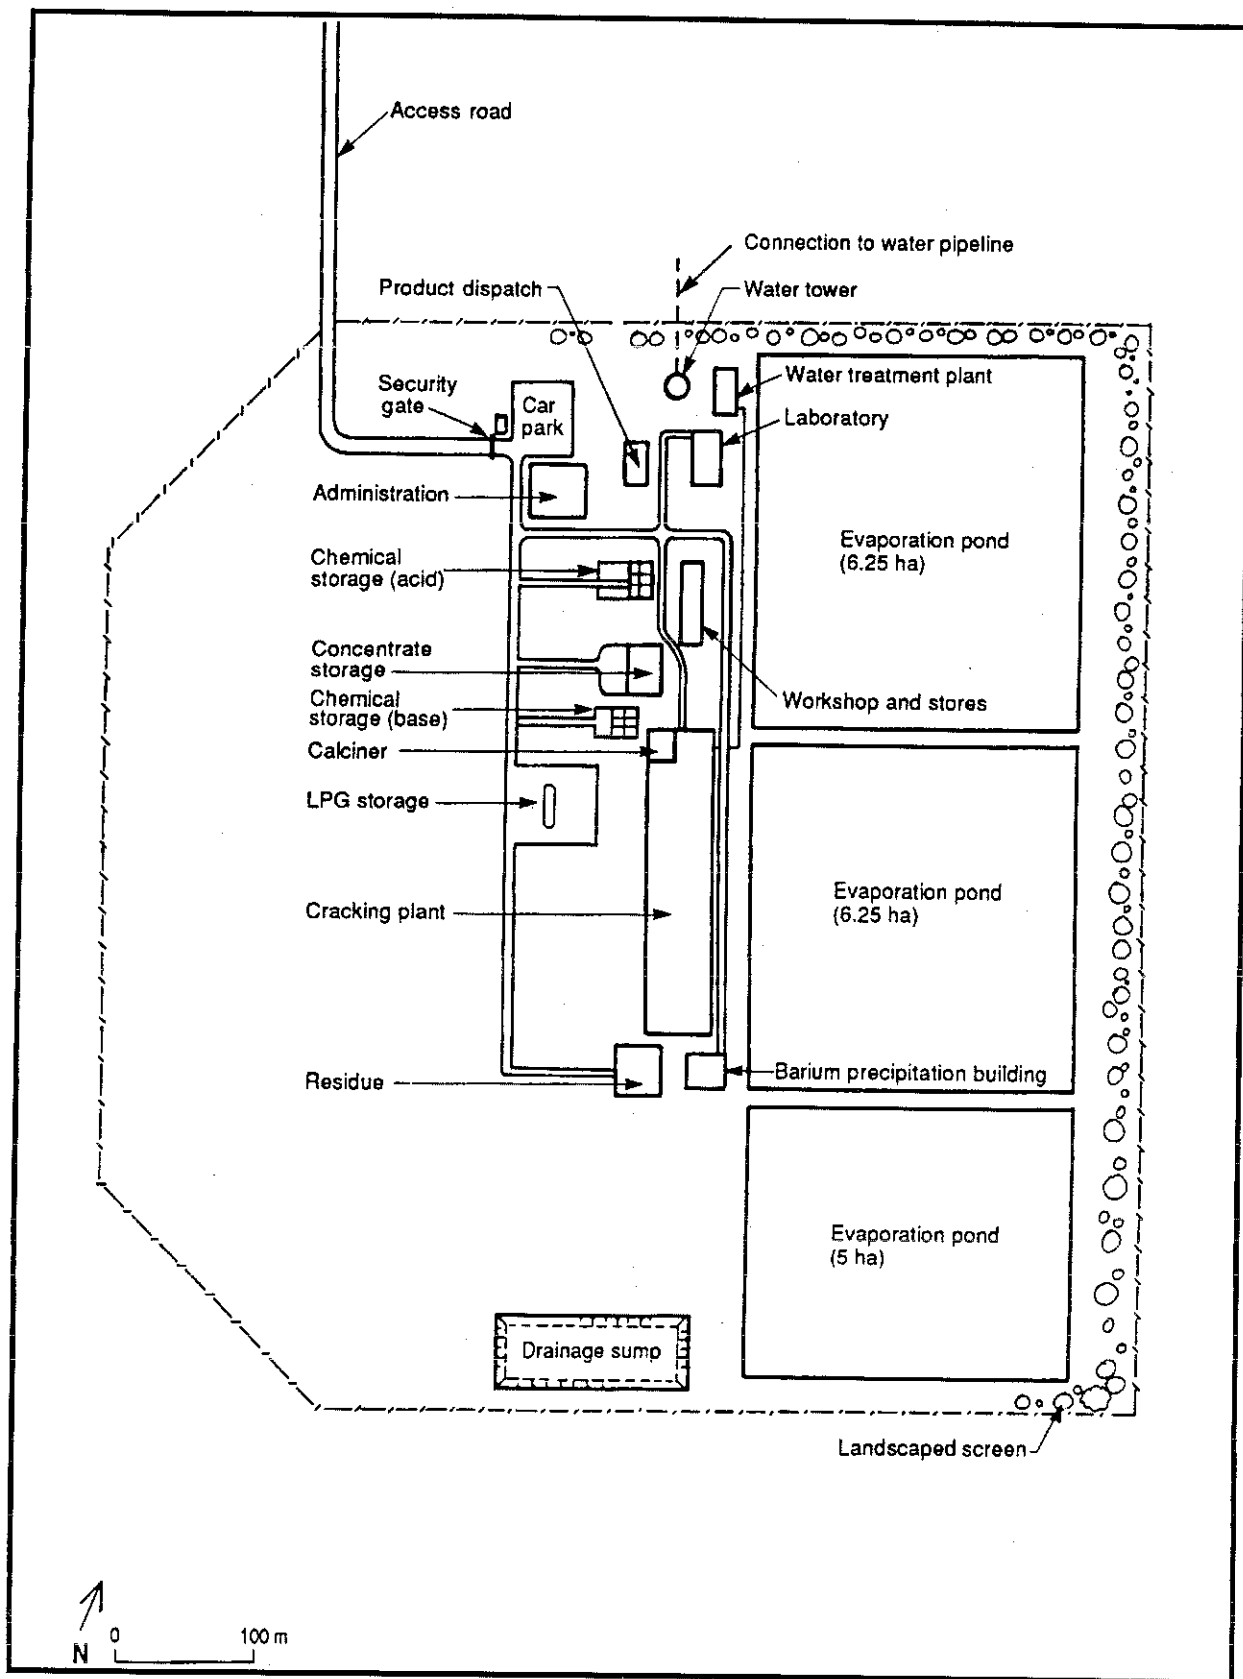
Conceptual layout of proposed secondary processing facilities at Meenaar (Source: Ashton's PER).
